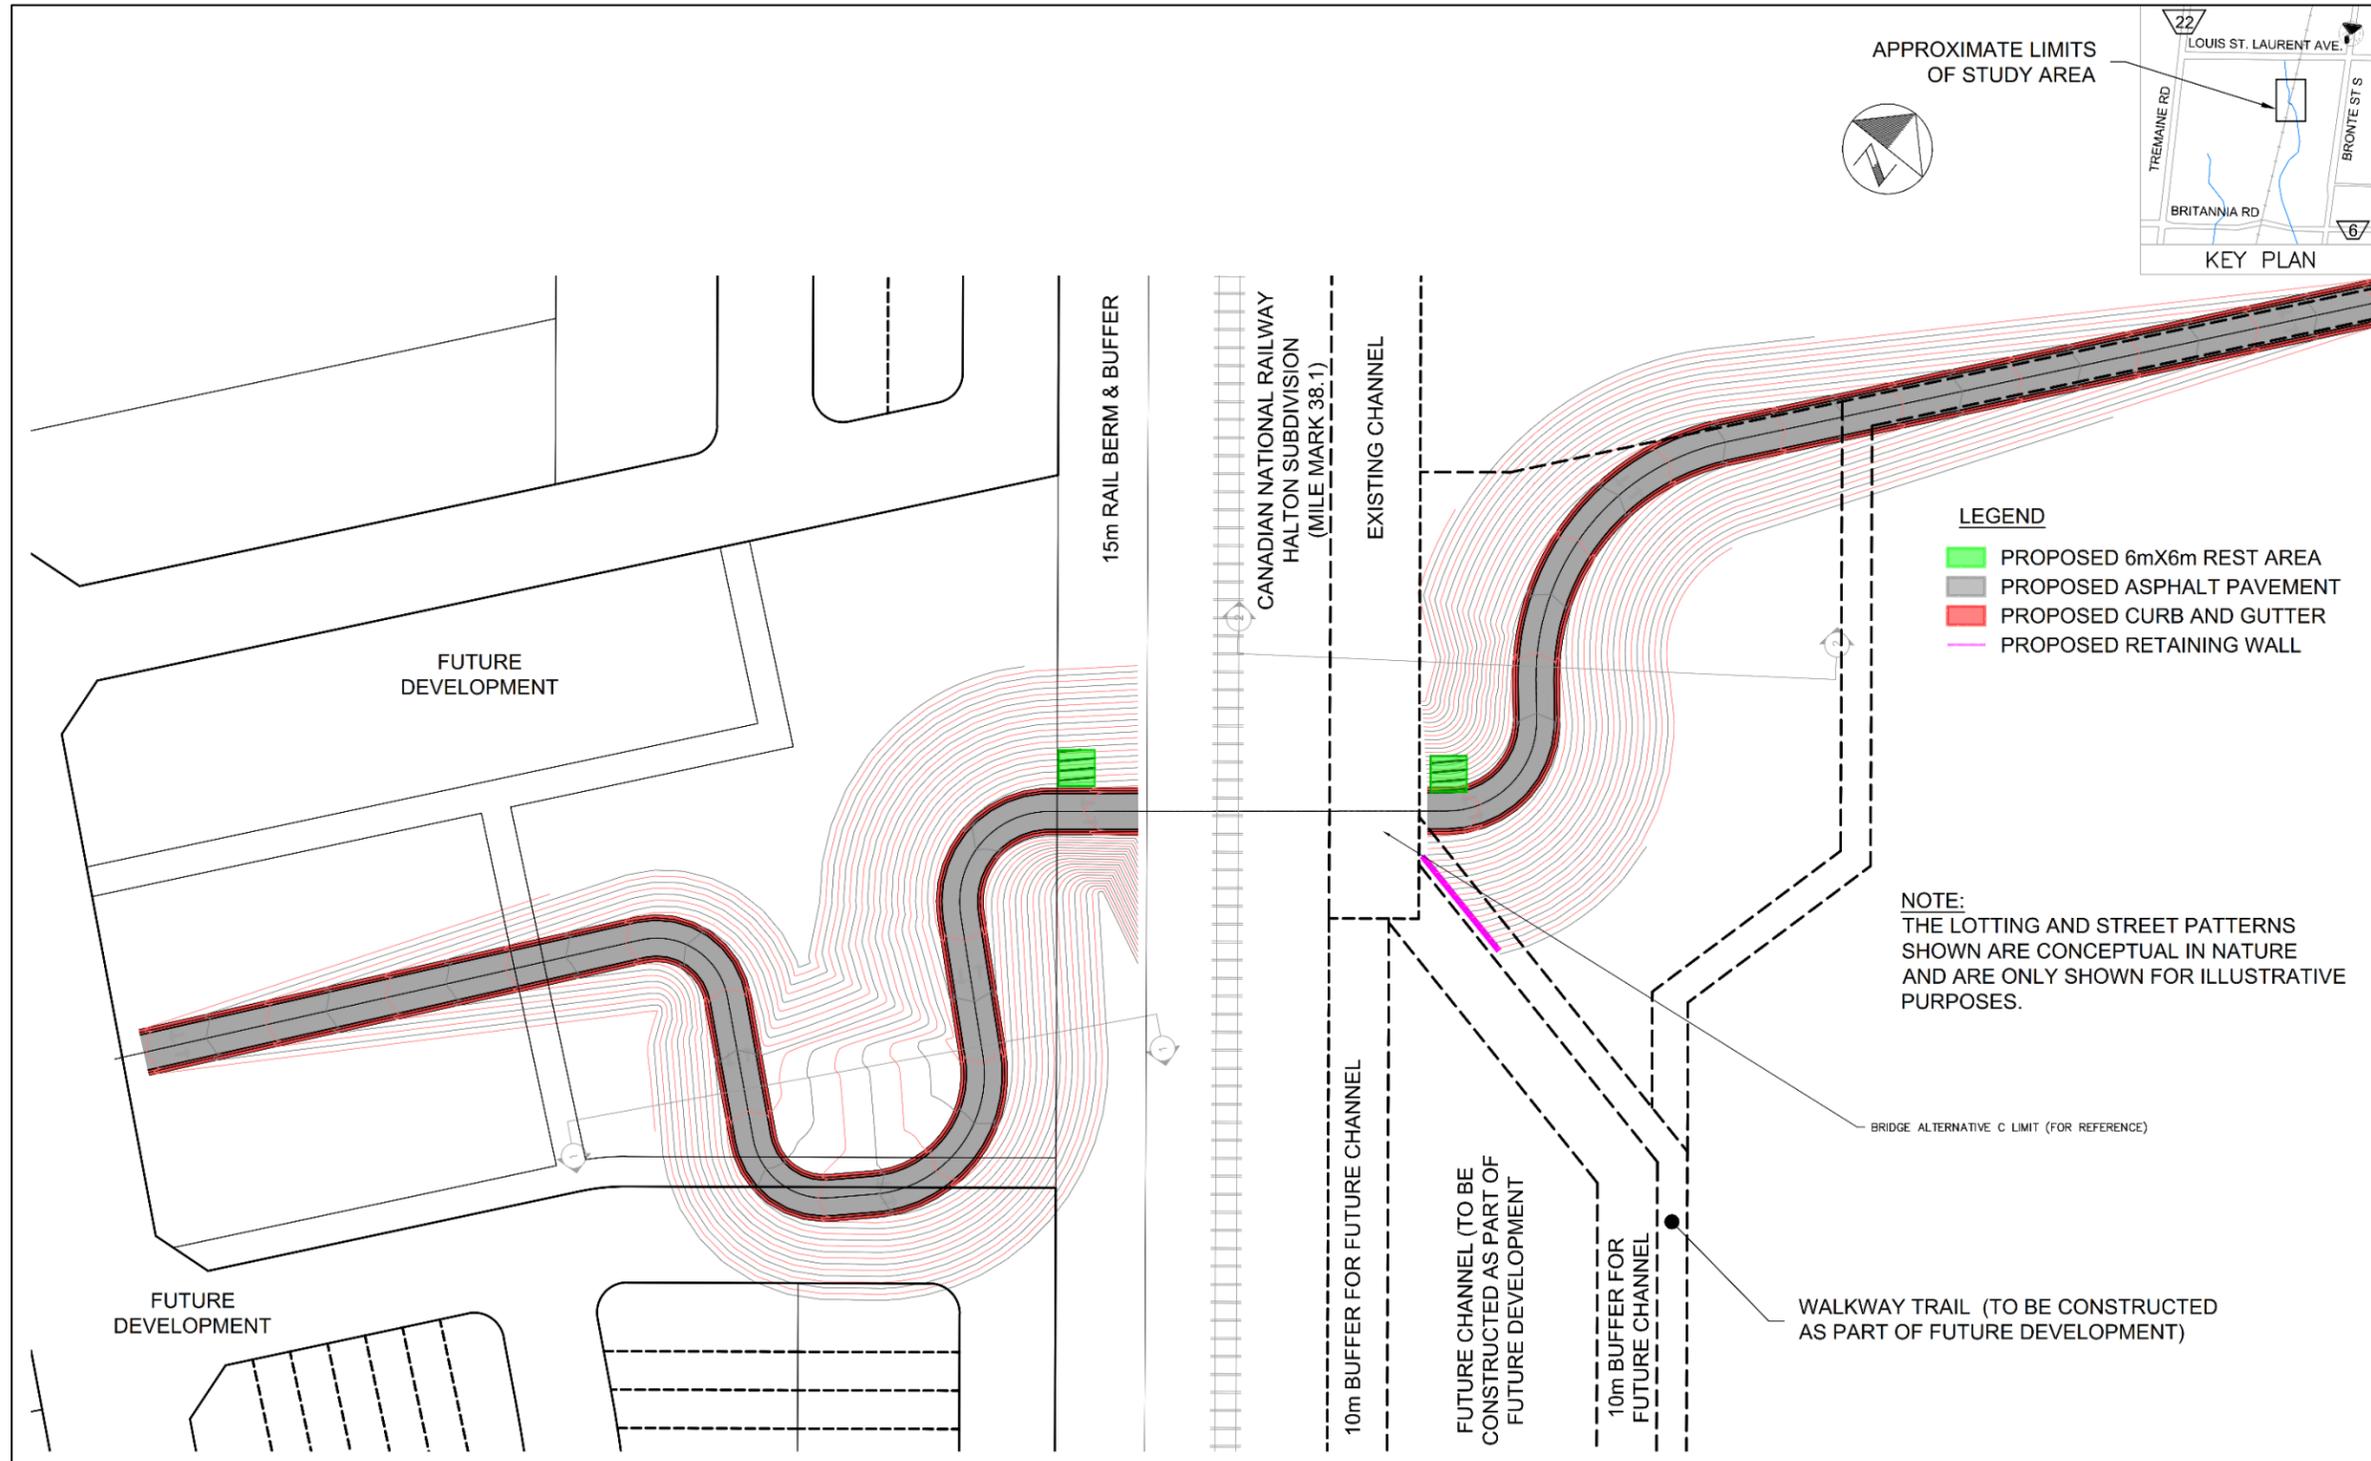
Bridge Structure Alternative A1: Bowstring Truss Bridge with Approach Alternative 1
